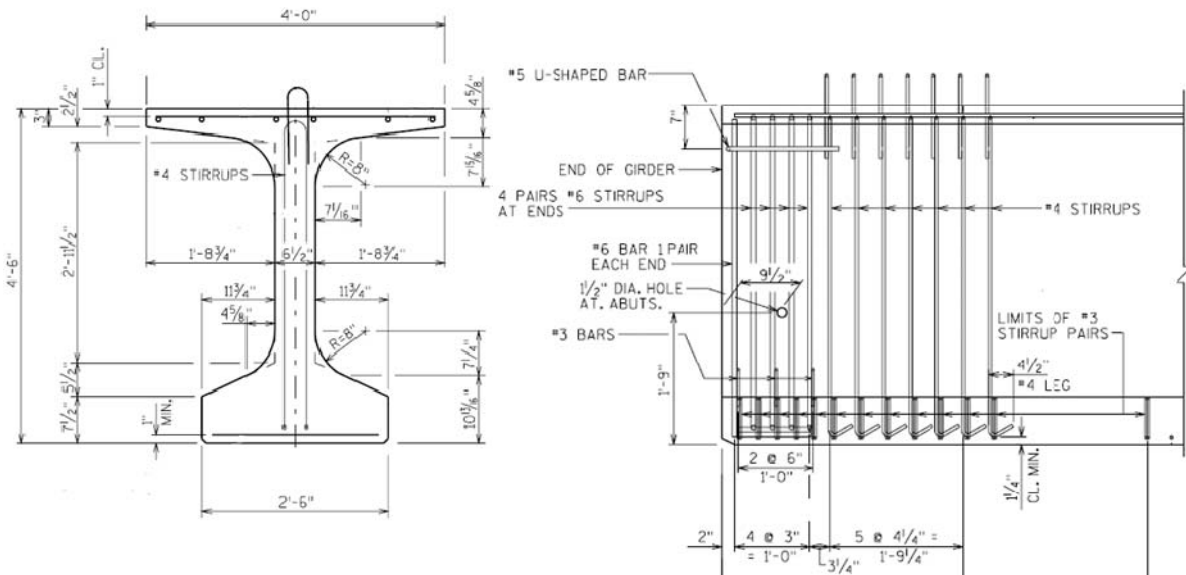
Cross section details and end reinforcement of the Spancrete 54W girder (from Wisconsin Bridge Manual).
